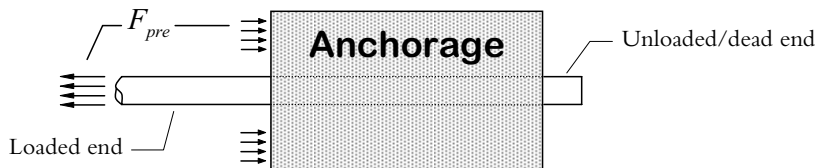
External force equilibrium for an anchorage used to anchor unbonded tendons
